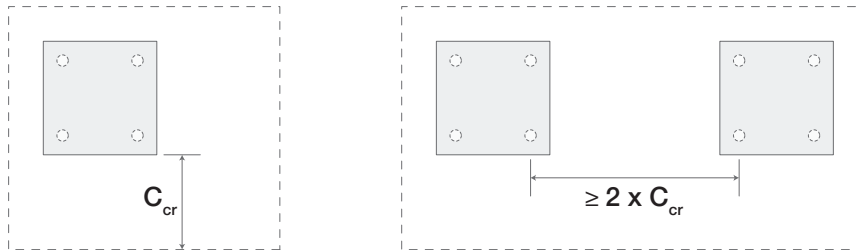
THE EDGE DISTANCE C_{cr} OF EFP, EHD FASTENING PLATE FROM THE EDGE OF THE CONCRETE STRUCTURE AND THE CENTER DISTANCE BETWEEN ADJACENT FASTENING PLATES.
